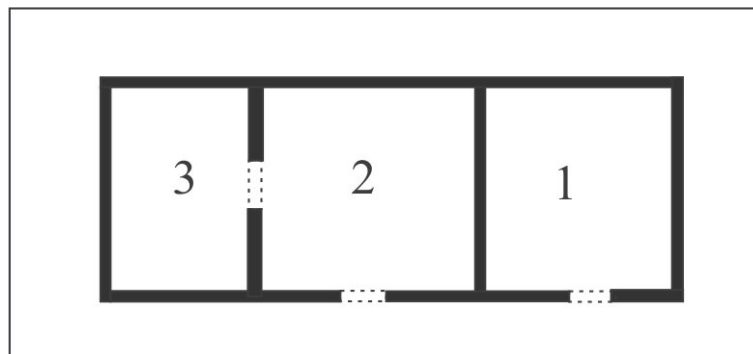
Plan of the roman house III (after KIRÁLY 1891)
